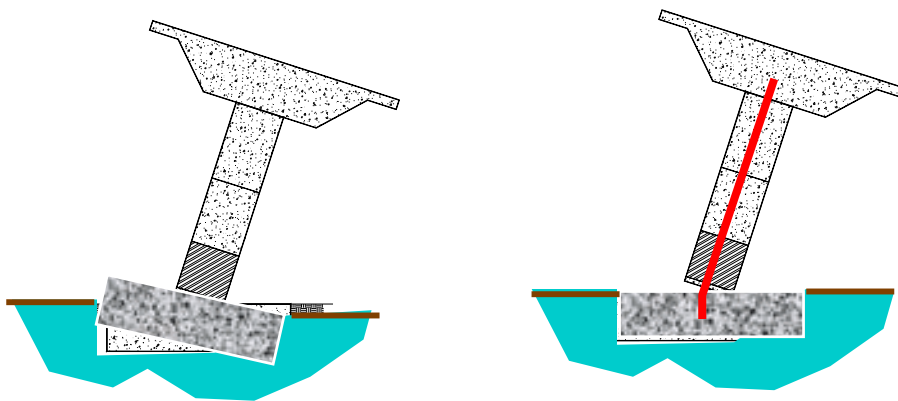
ROCKING FOUNDATION AND POST-TENSIONED COLUMN
